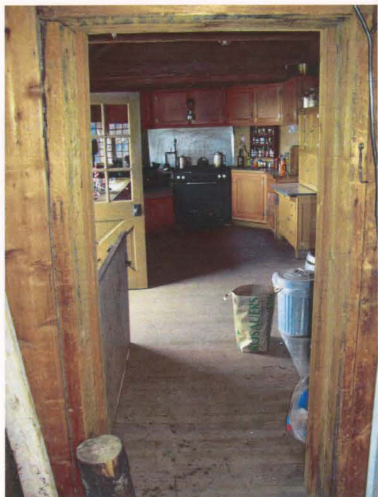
Kitchen recently restored to original location with open ceiling. View through dining room doorway. View facing NE
